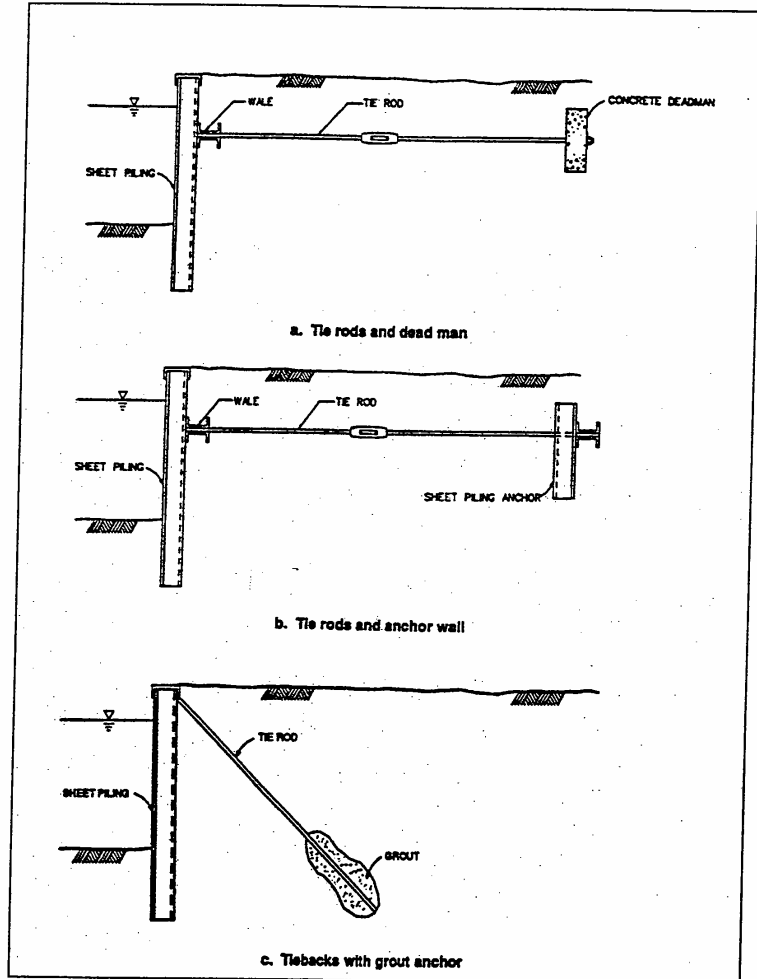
Anchored walls (Source: COE Engineering Manual)
